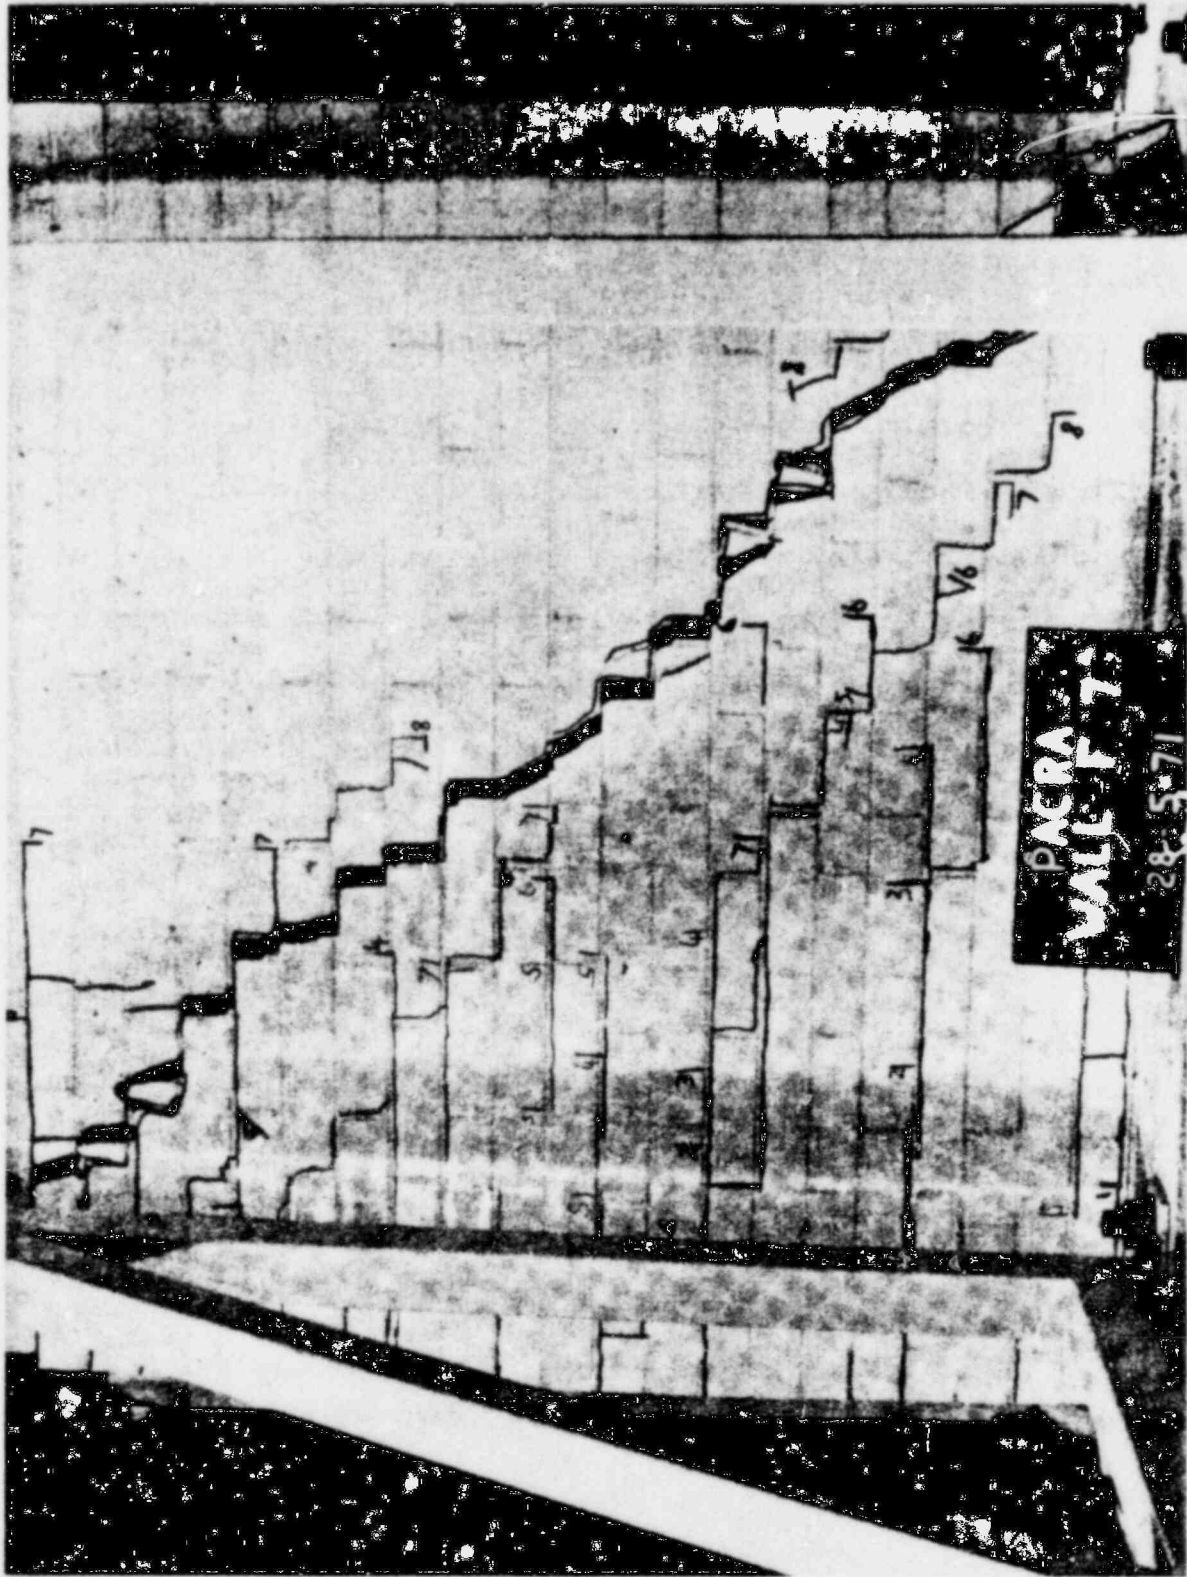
TYPICAL SHEAR FAILURE UNDER MONOTONIC LOADING
